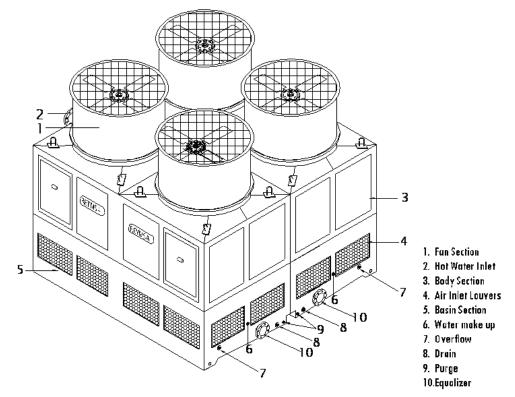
Quadruple Fan Cooling Tower - Pipe Connections
